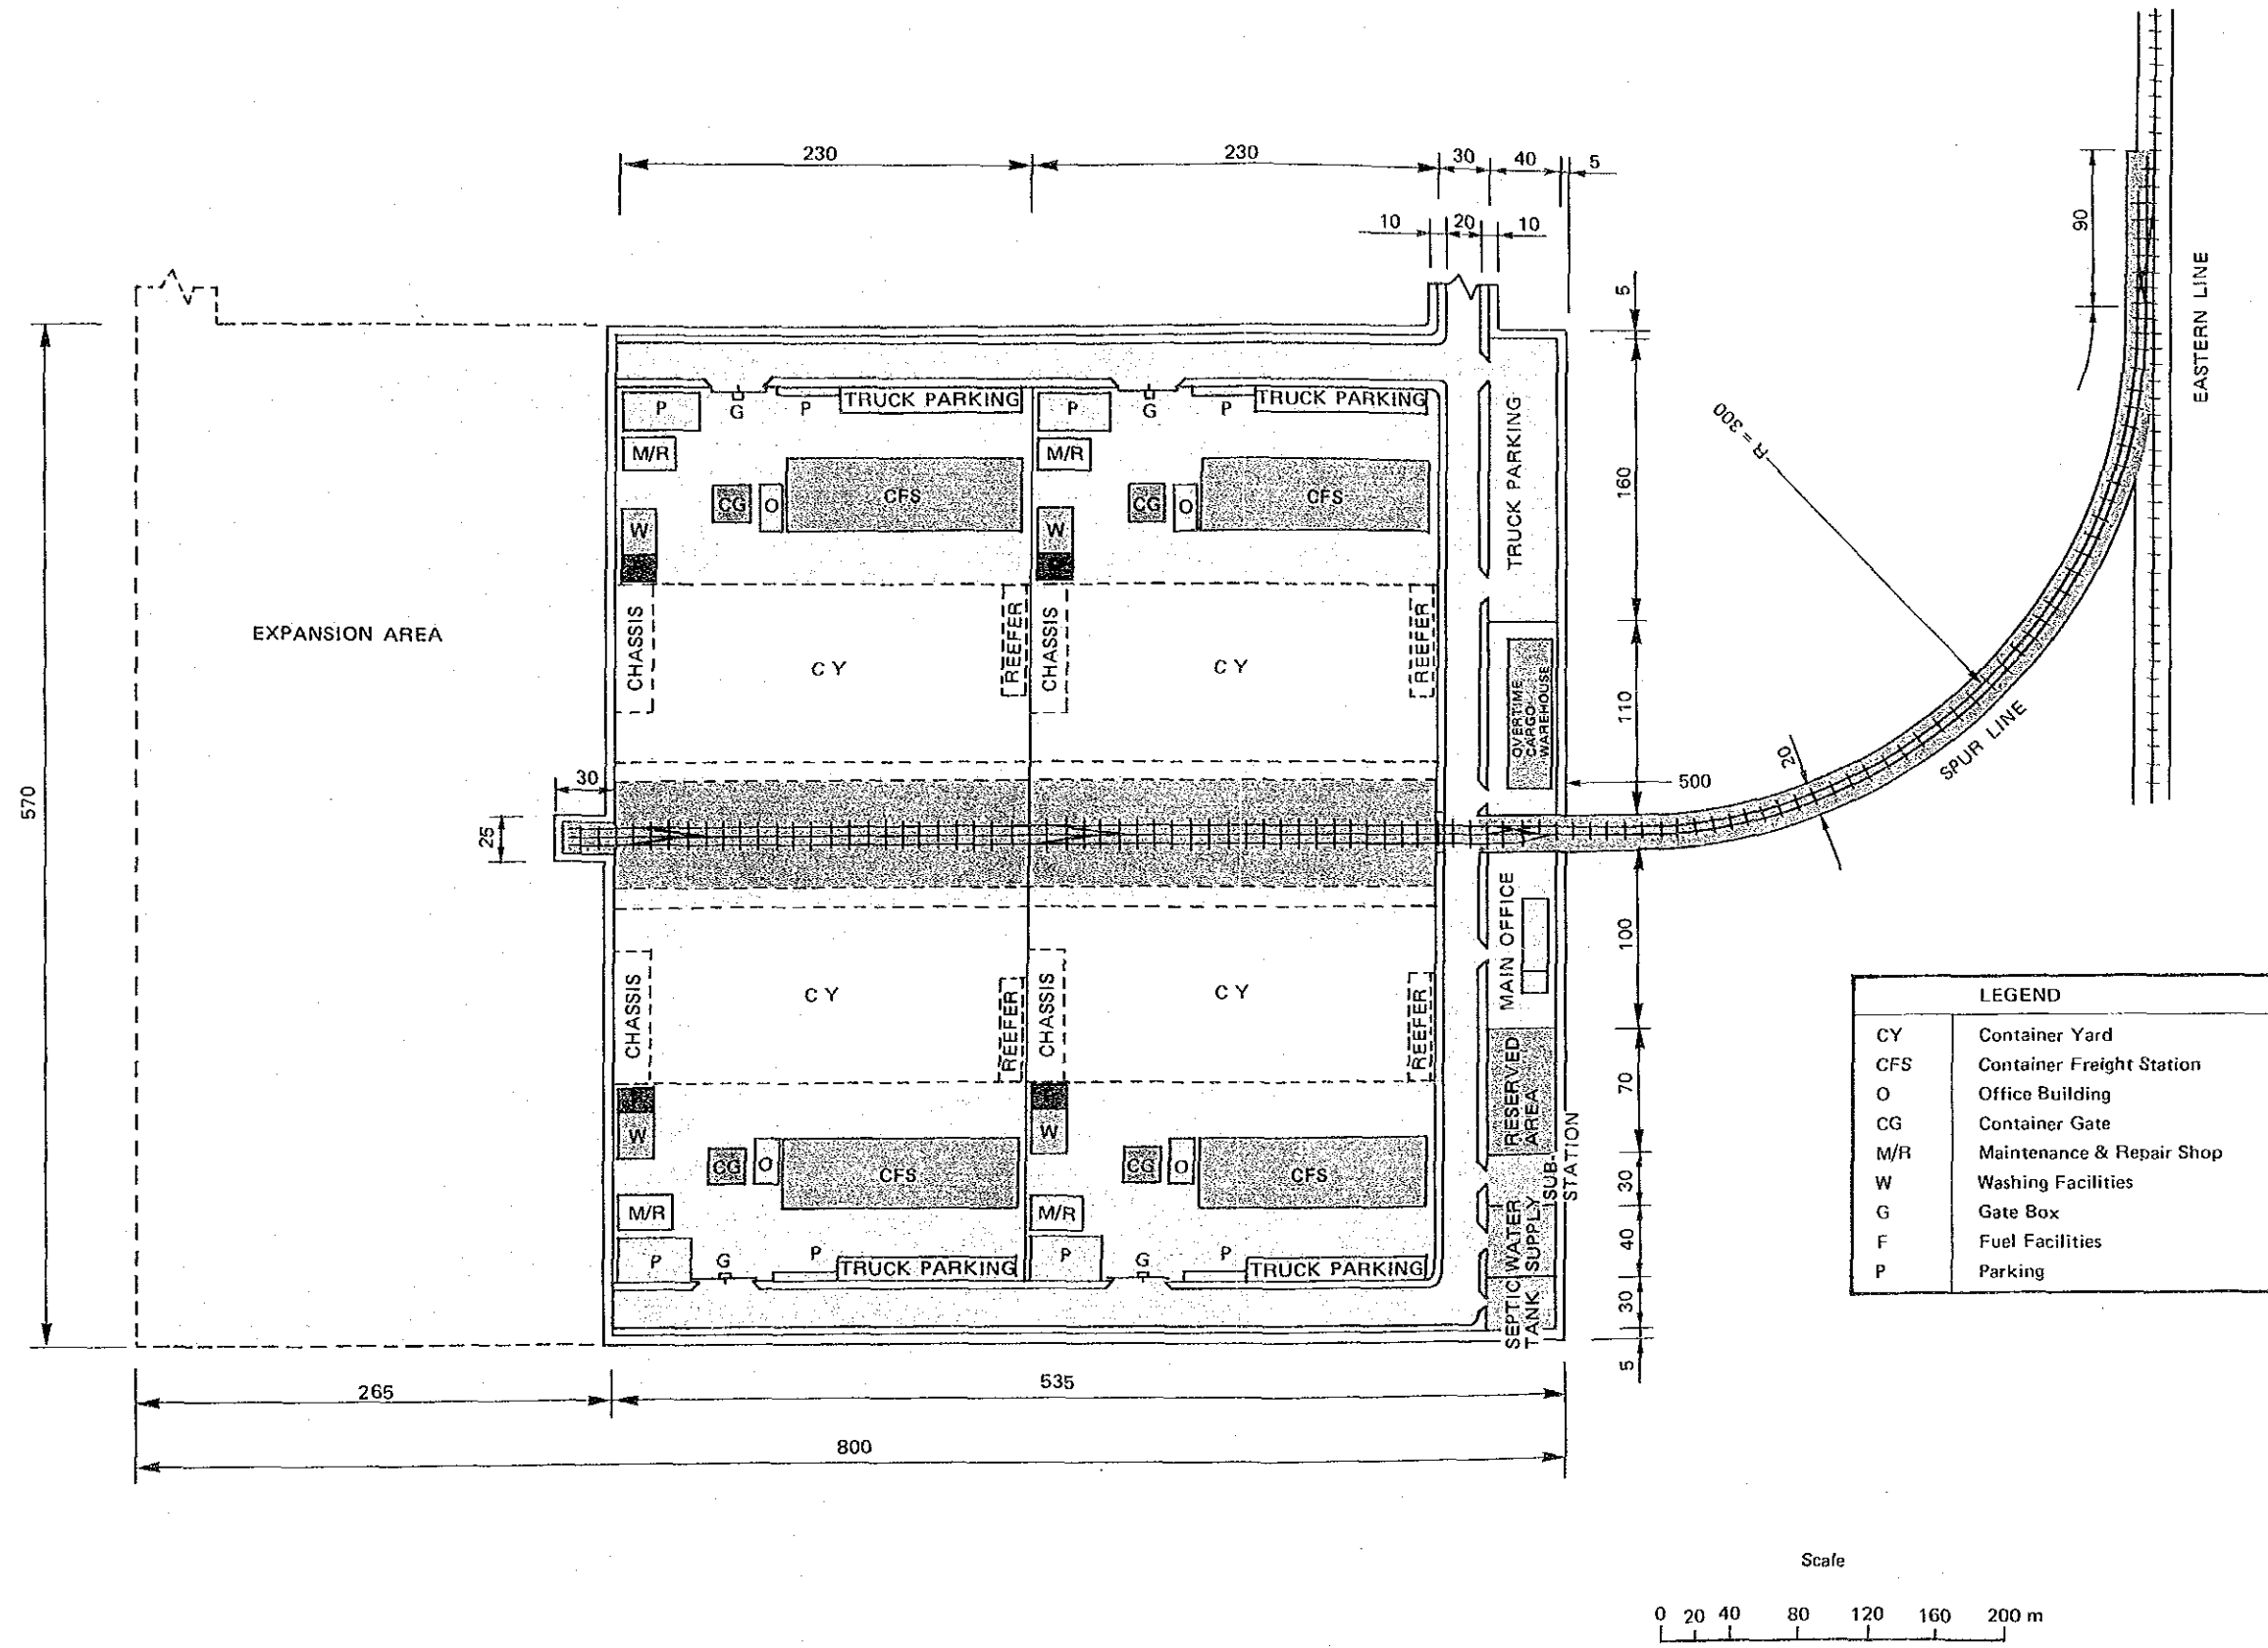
Layout of the Lat Krabang Inland Container Depot First Stage Plan (1996)
